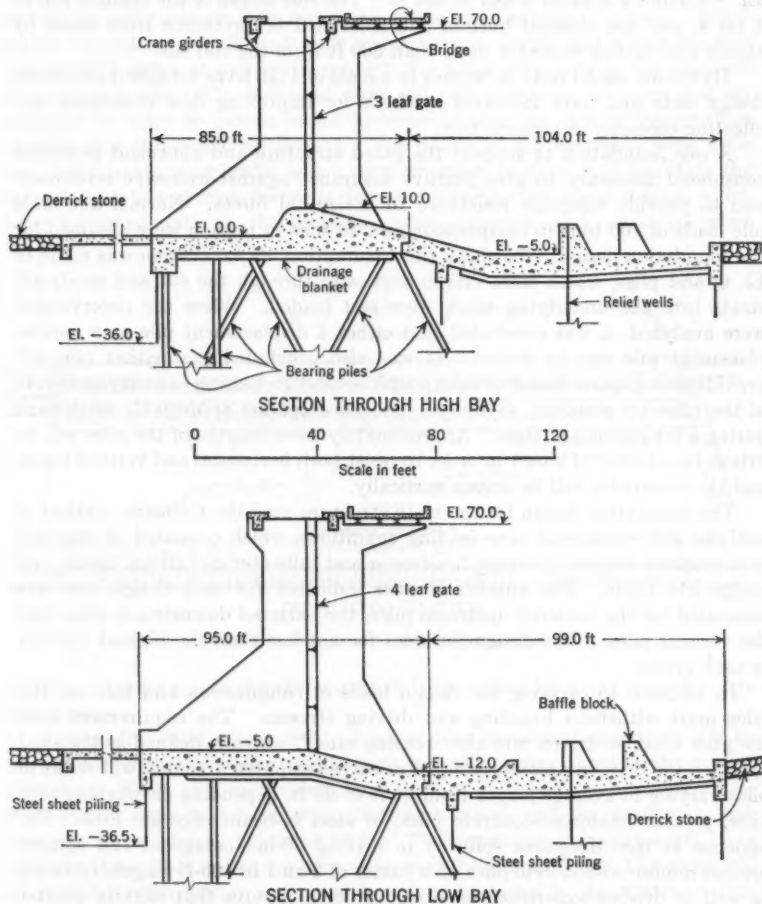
SECTIONS OF LOW-SILL CONTROL STRUCTURE
